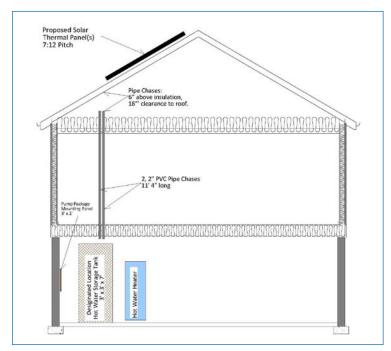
Plumbing Riser Detail. The plumbing riser detail should include the pipe chase location and size and balance of system component locations.
